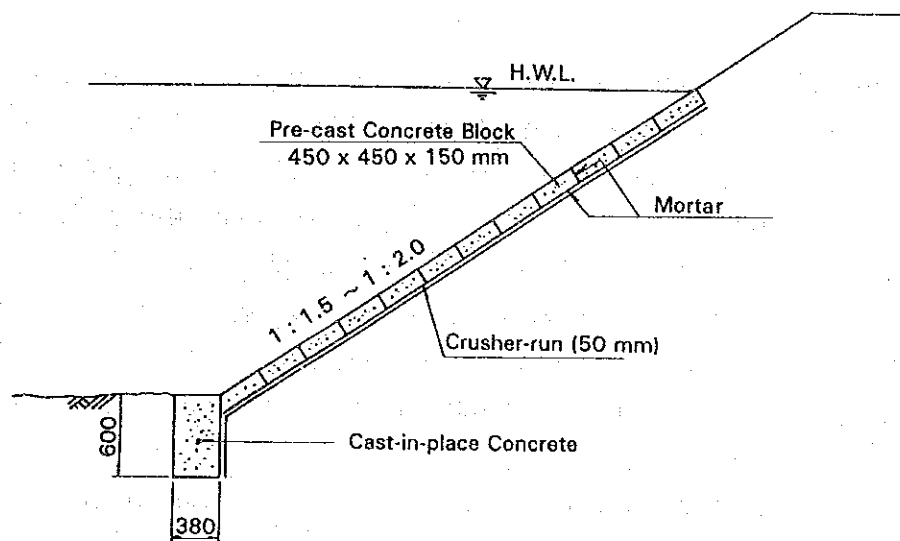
TYPICAL CROSS SECTION OF RIVER PROTECTION
